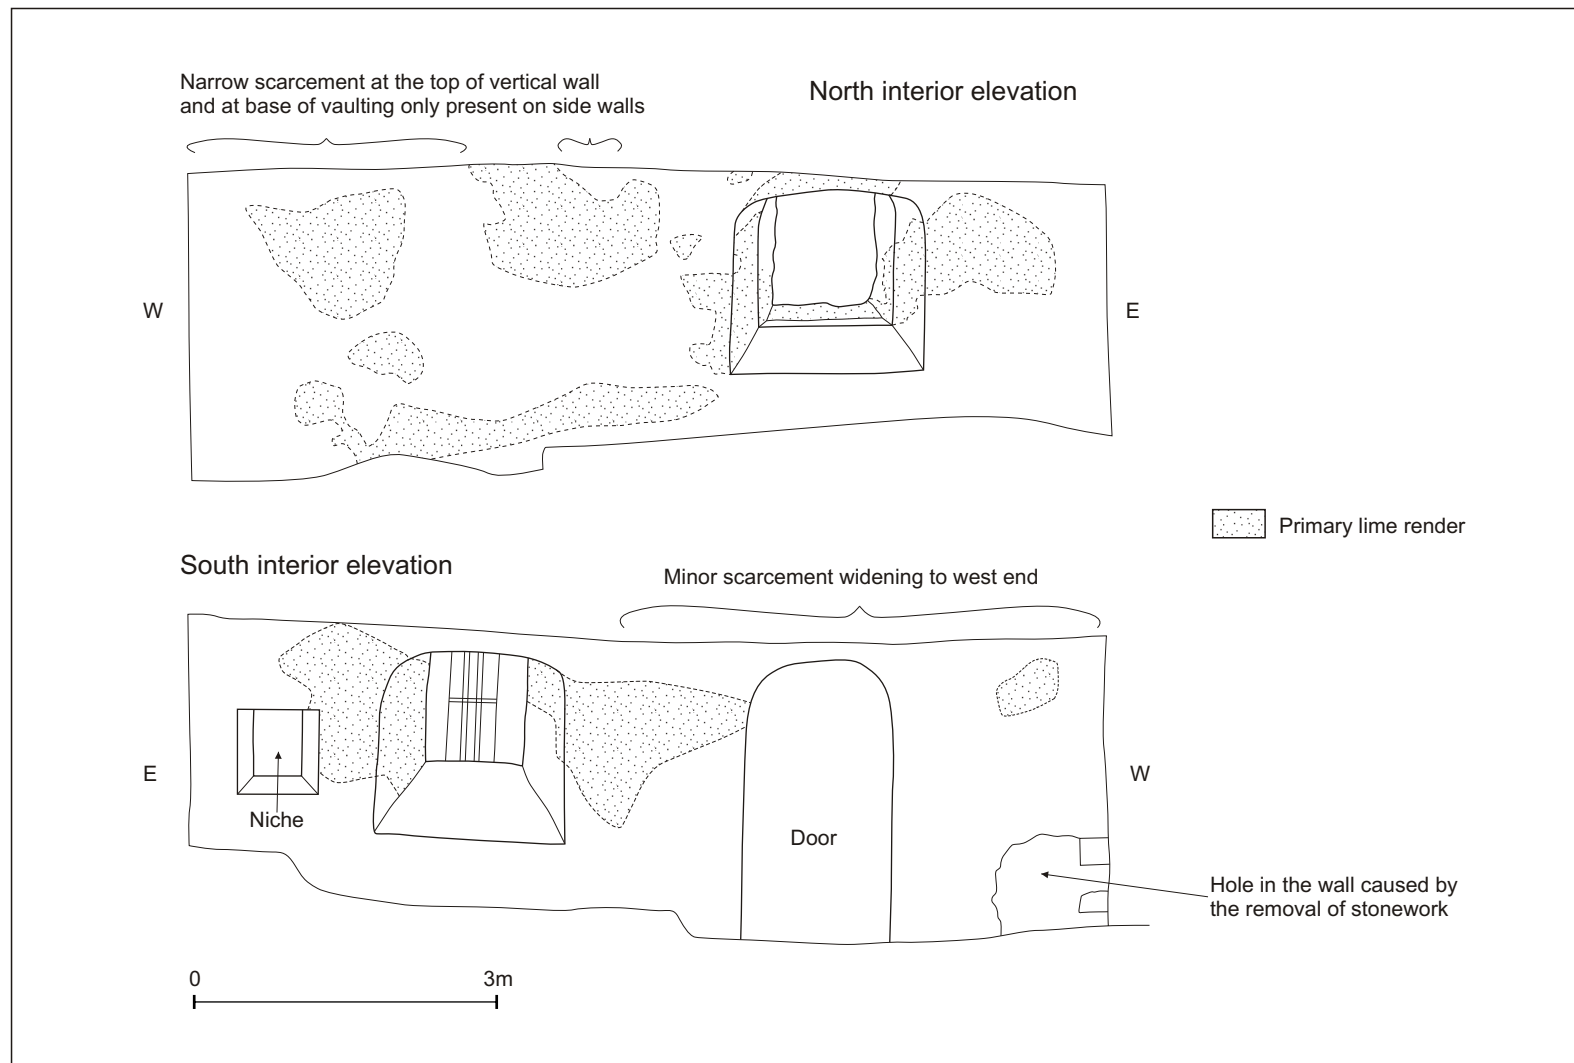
St Michael's Chapel, Torre, north and south interior elevations measured drawings
